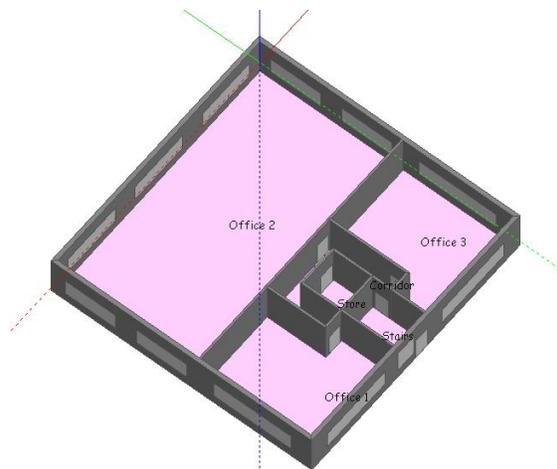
Floor plan of simple deep plan office building, (Building 2)
